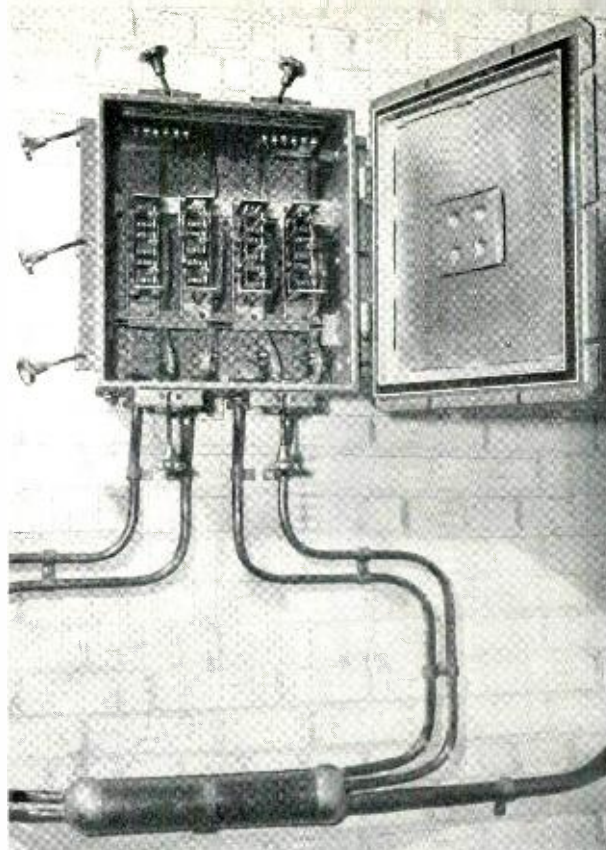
The transfer switching equipment in its protective case. This installation is on the wall of a cable vault in Hempstead, Long Island.
